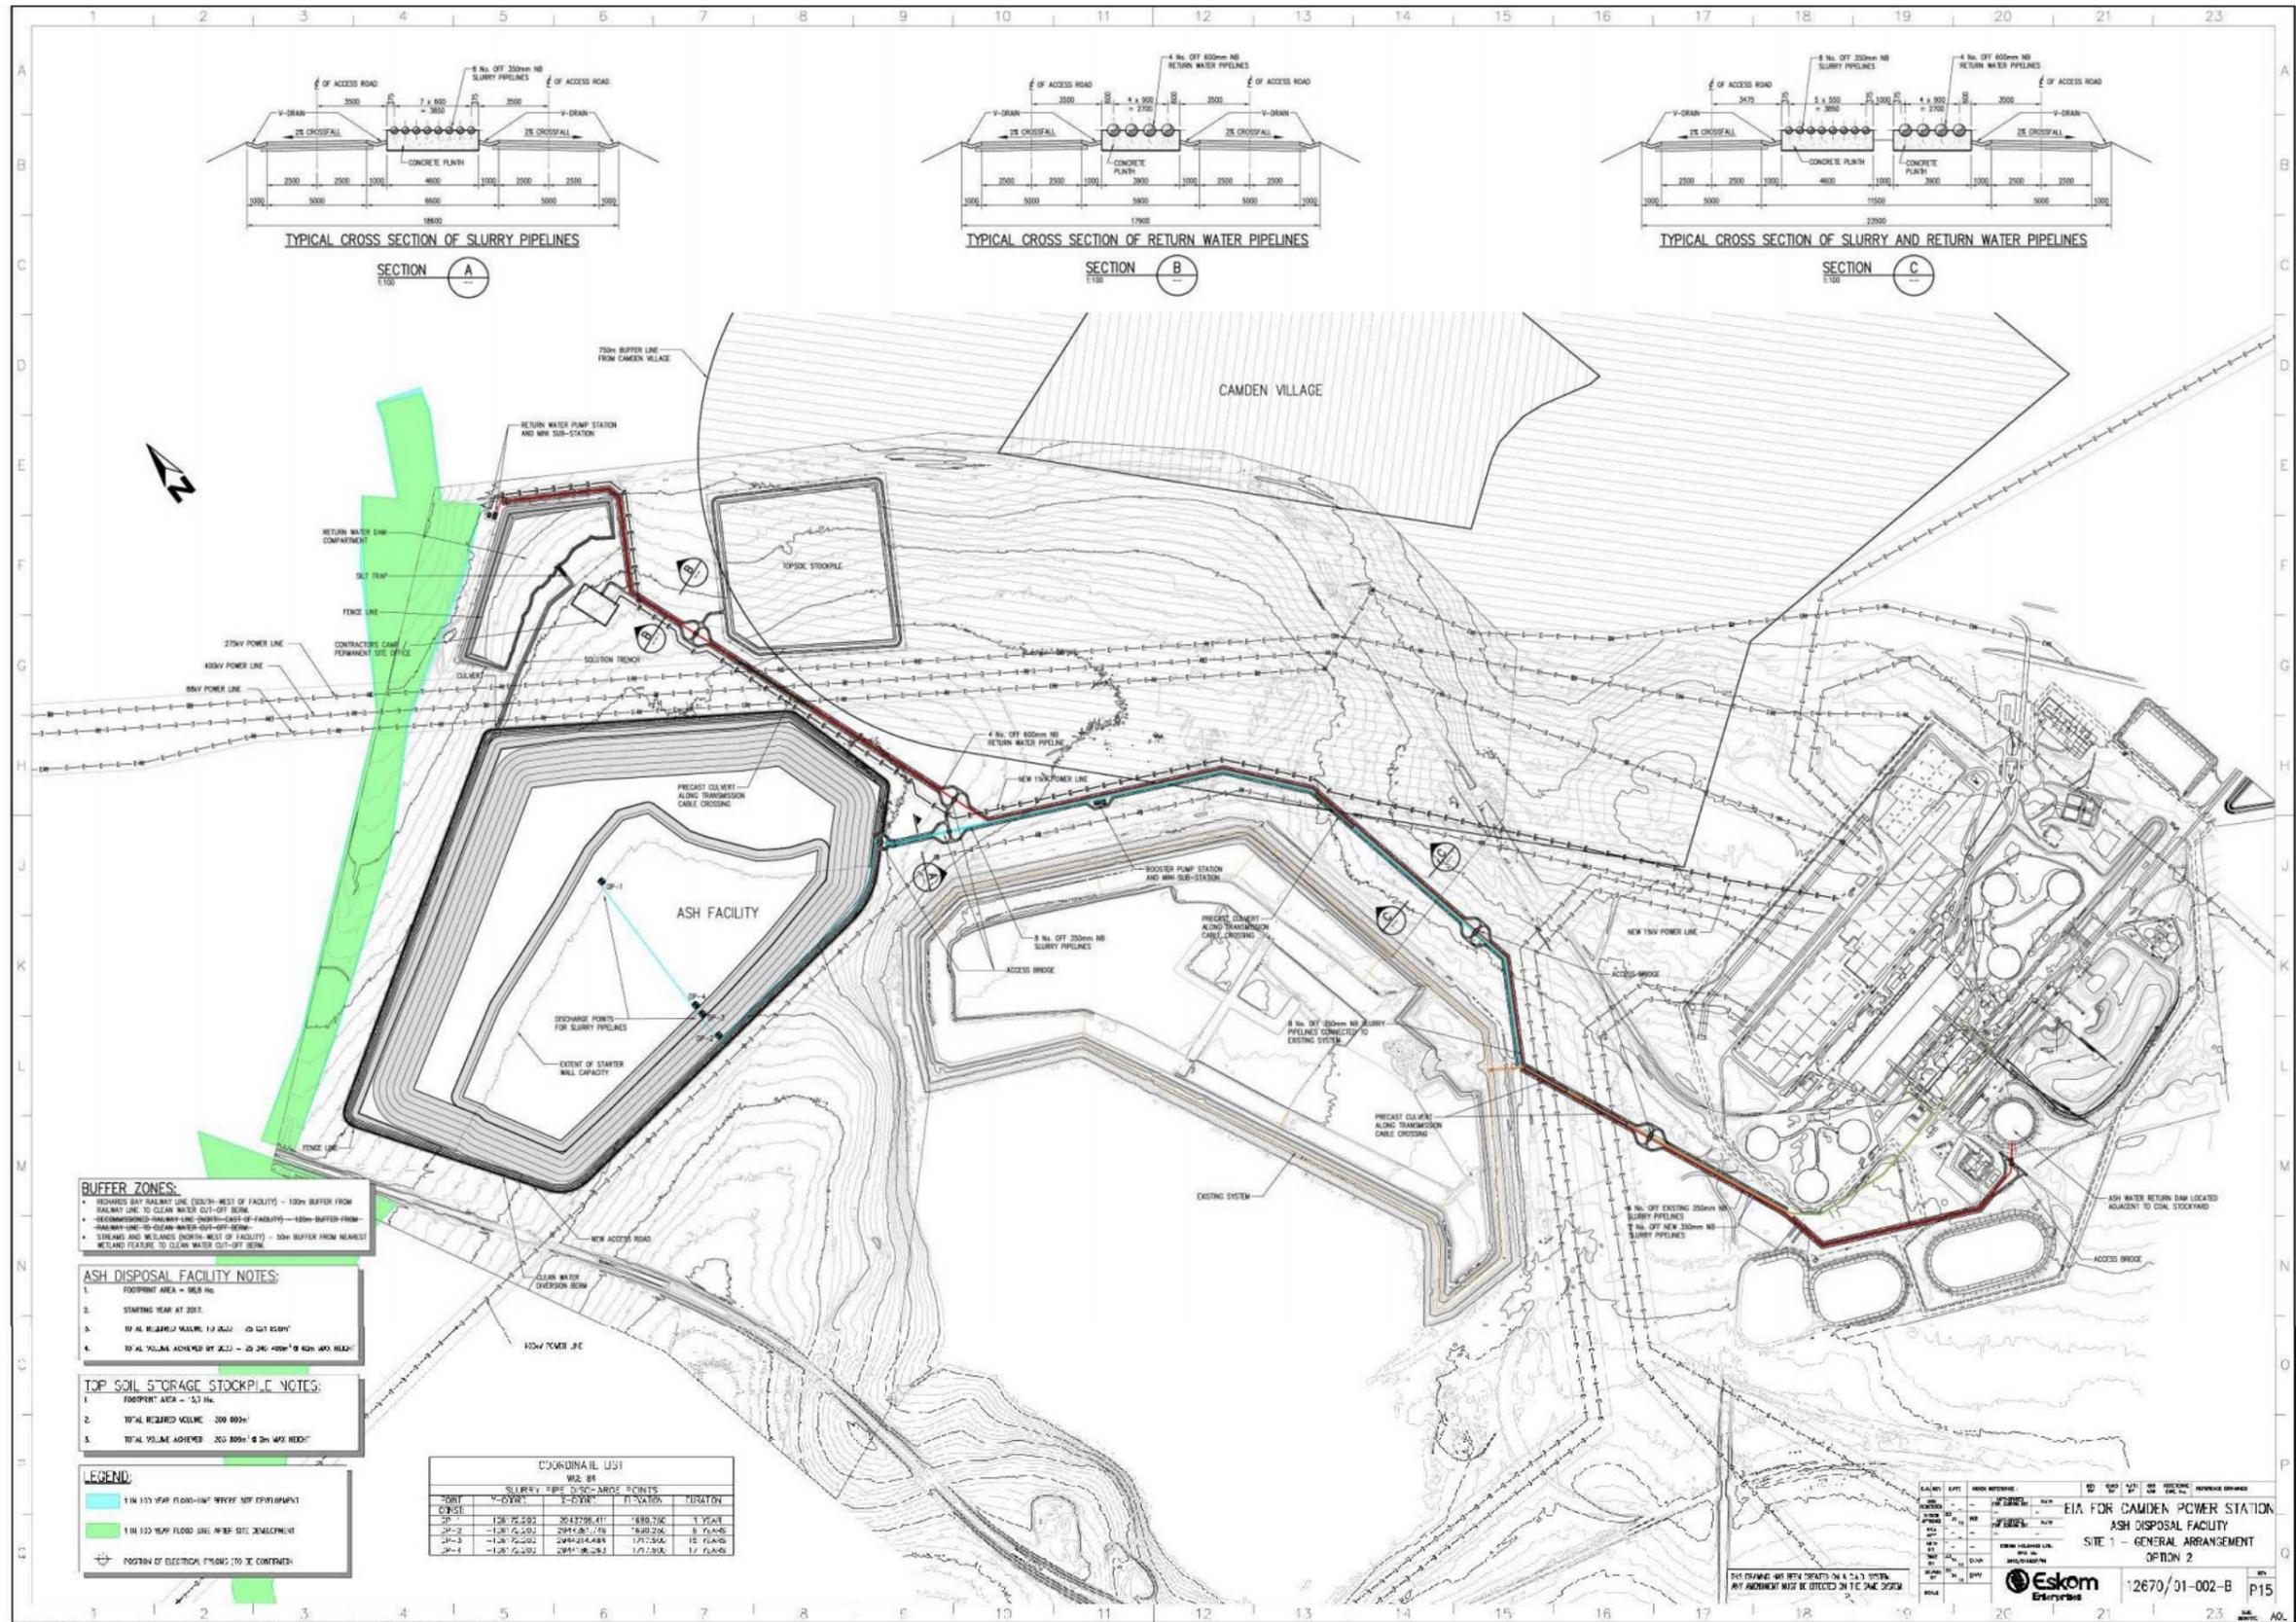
Camden Ash Disposal Facility Expansion Project Layout Map
